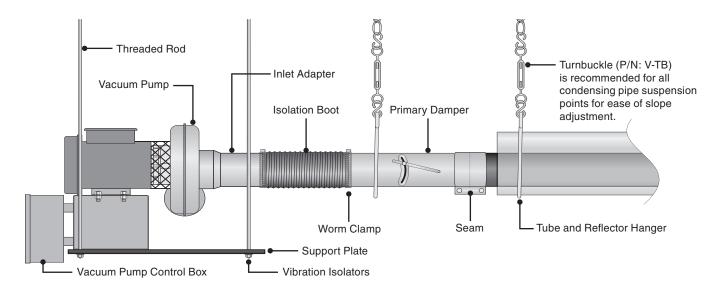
• PB Series Vacuum Pump Mounting Details
